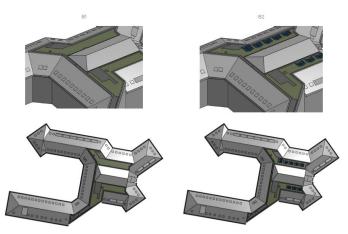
Green roof and solar green roof options for the school roof (roof renovation analysis by ANERDGY, Task 4.4)
